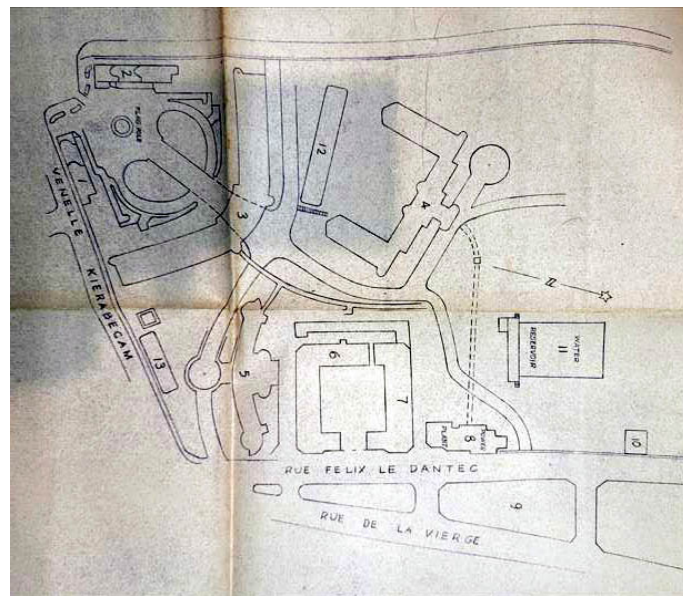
Plot Plan—Civil and Military Hospital—Brest, Office of the Engineer, Brittany, Base Section—Com. Z. Etoussa—1 building No. 1; 2 building No. 2; 3 Consultation Pavilion; 4 Maternity and Surgery Pavilion; 5 Small Payers* Pavilion; 6 building No. 6; 7 building No. 7; 8 Power Plant bunkers and annexed house; 9 Felix Le Dantec road buildings; 10 bunker SK; 11 Water reservoir; 12 Great Bunker—SK/M × 3; 13 bunker SK/M × 2. (Hurley, 1944) * Small payers were persons able to pay only part the medical expenses.
